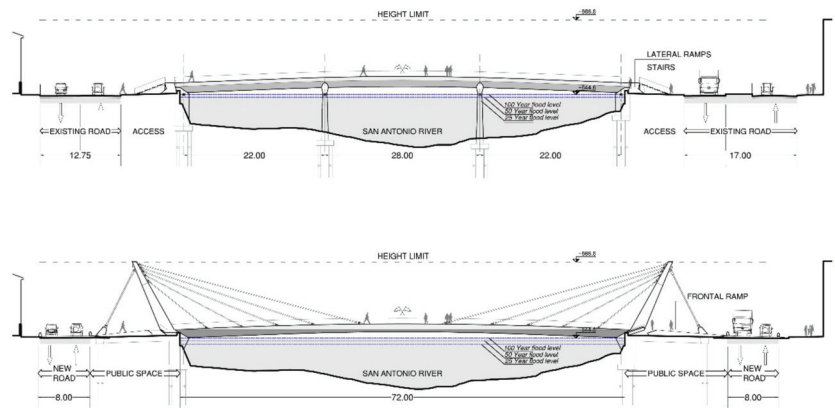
Top: early 3-span proposal: accesses were uninviting as ramps could only occur laterally. Bottom: selected single-span cable-stayed typology, together with new public spaces and road reconfigurations for friendlier accesses.
